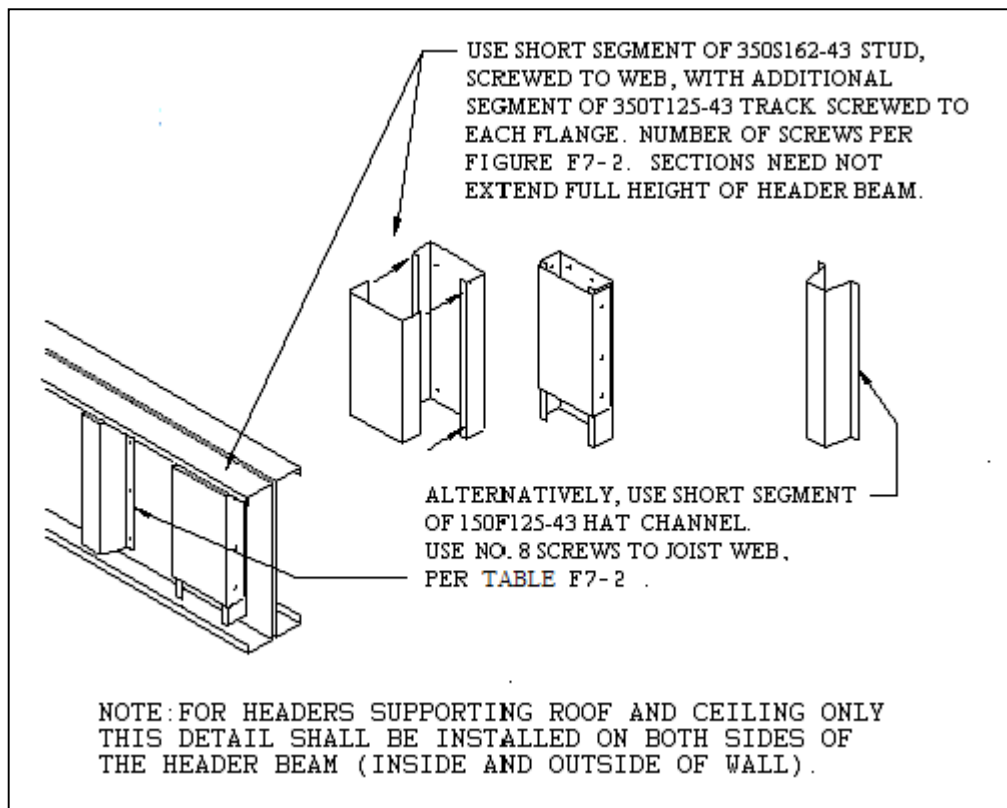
Back-to-Back Header Beam Reinforcement for Uplift Strap Connection
